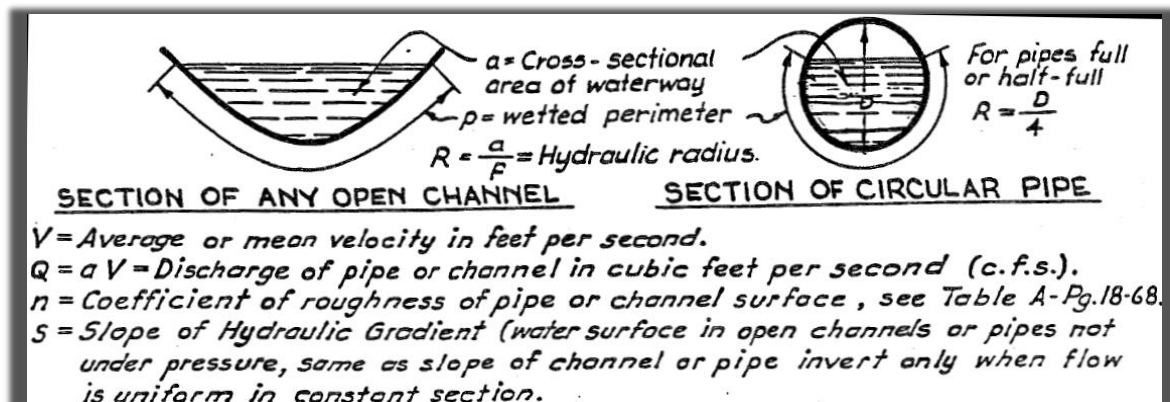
b Cross-sectional parameters of open channel flow and circular pipe
